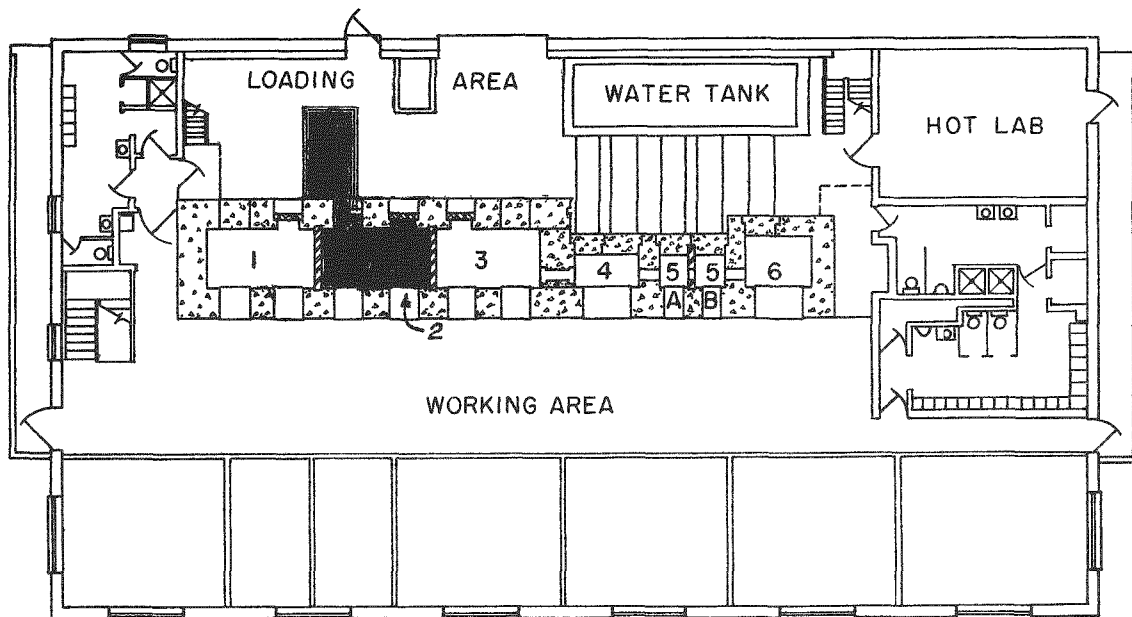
Plan of general-purpose hot cells, Solid State Laboratory, building 3025, Oak Ridge.
